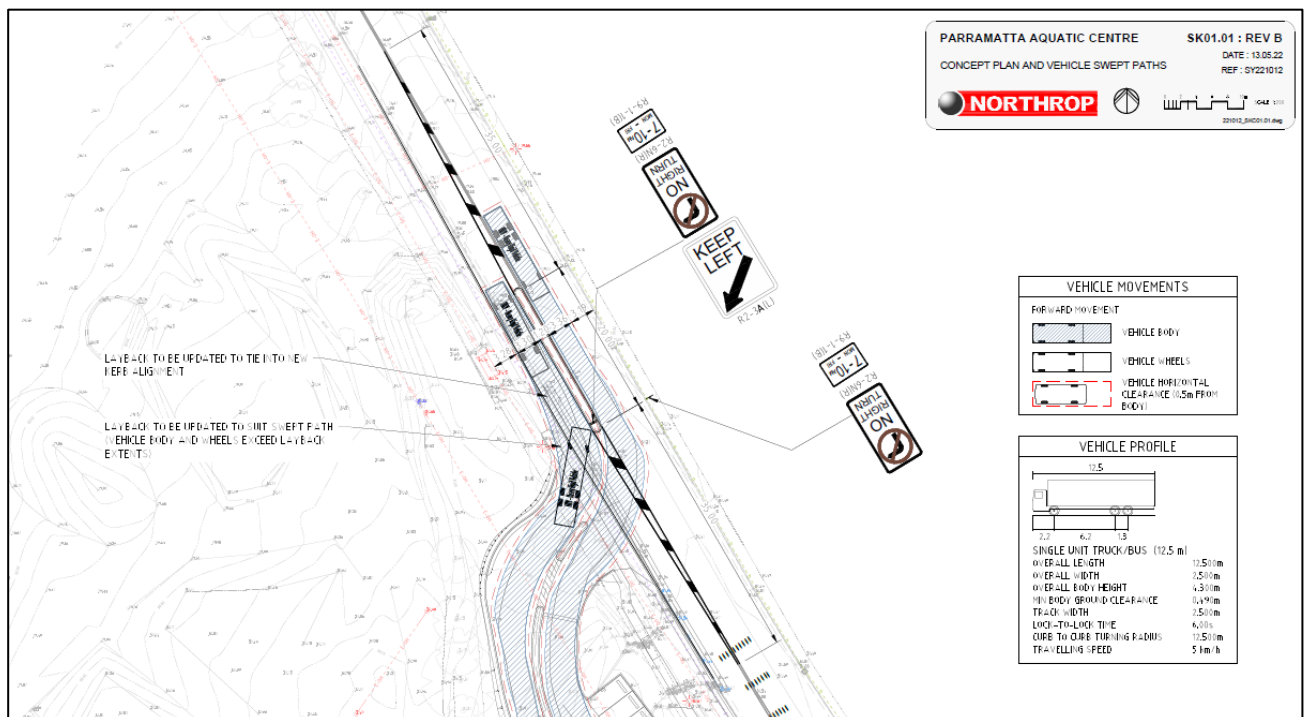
Concept plan for the proposed 'No Right Turn' restriction on Park Parade, Parramatta
